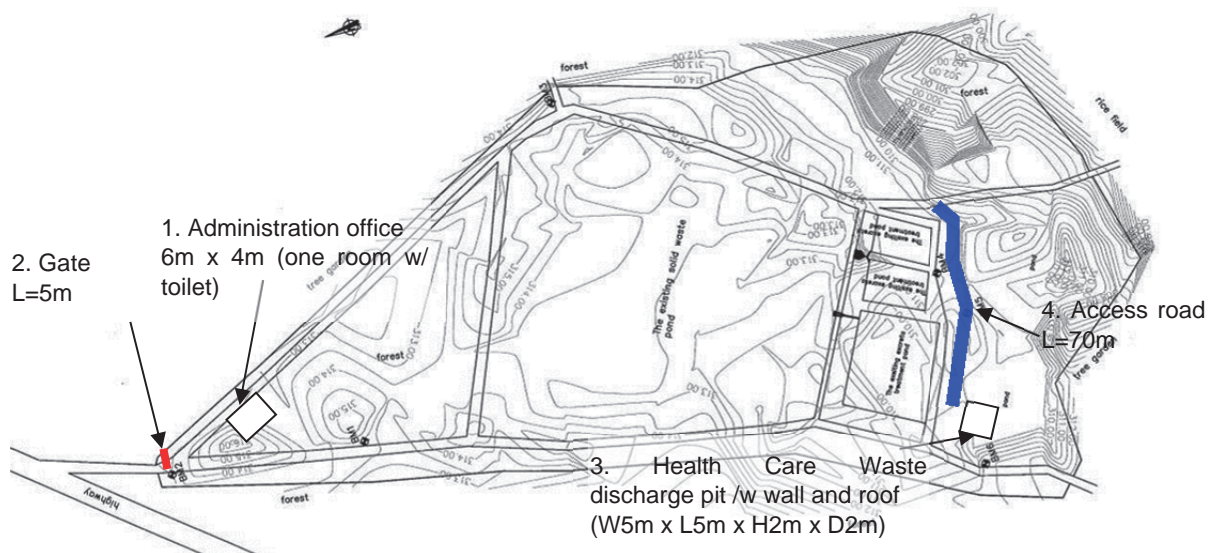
Improvement plan of infrastructure at KM9 existing final disposal site
